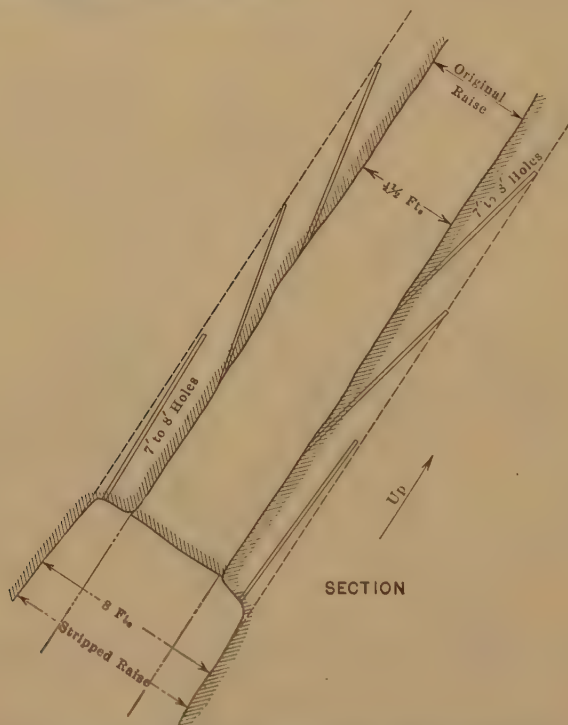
STRIPPING RAISE FROM BOTTOM—ARRANGEMENT OF HOLES.
